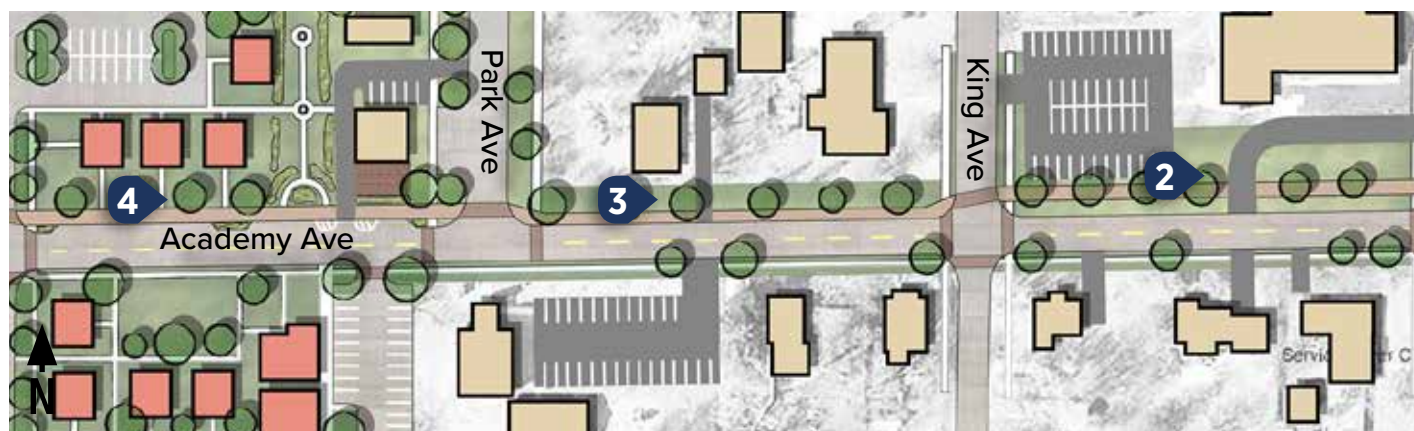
Academy Avenue: Queen Avenue to Khedive Street
